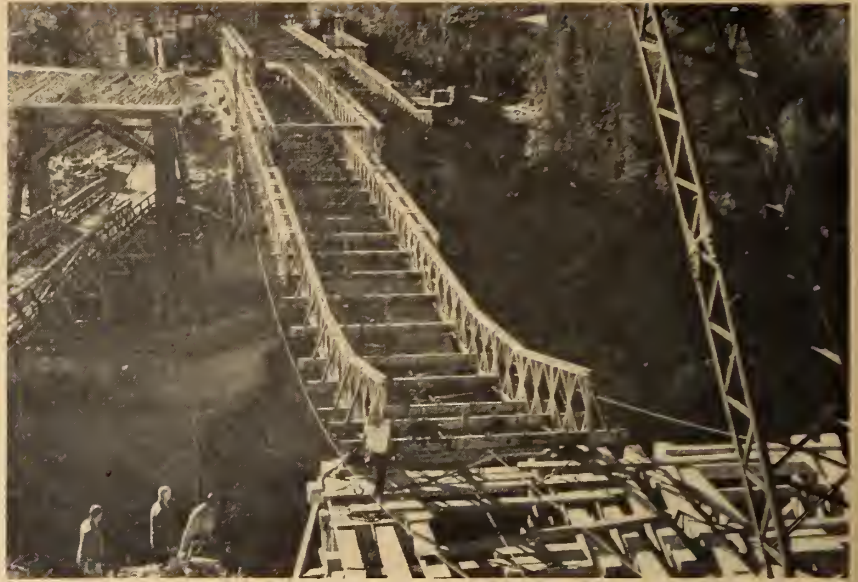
The cantilevered launching nose of the downstream Bailey bridge touches down on the south bank.
